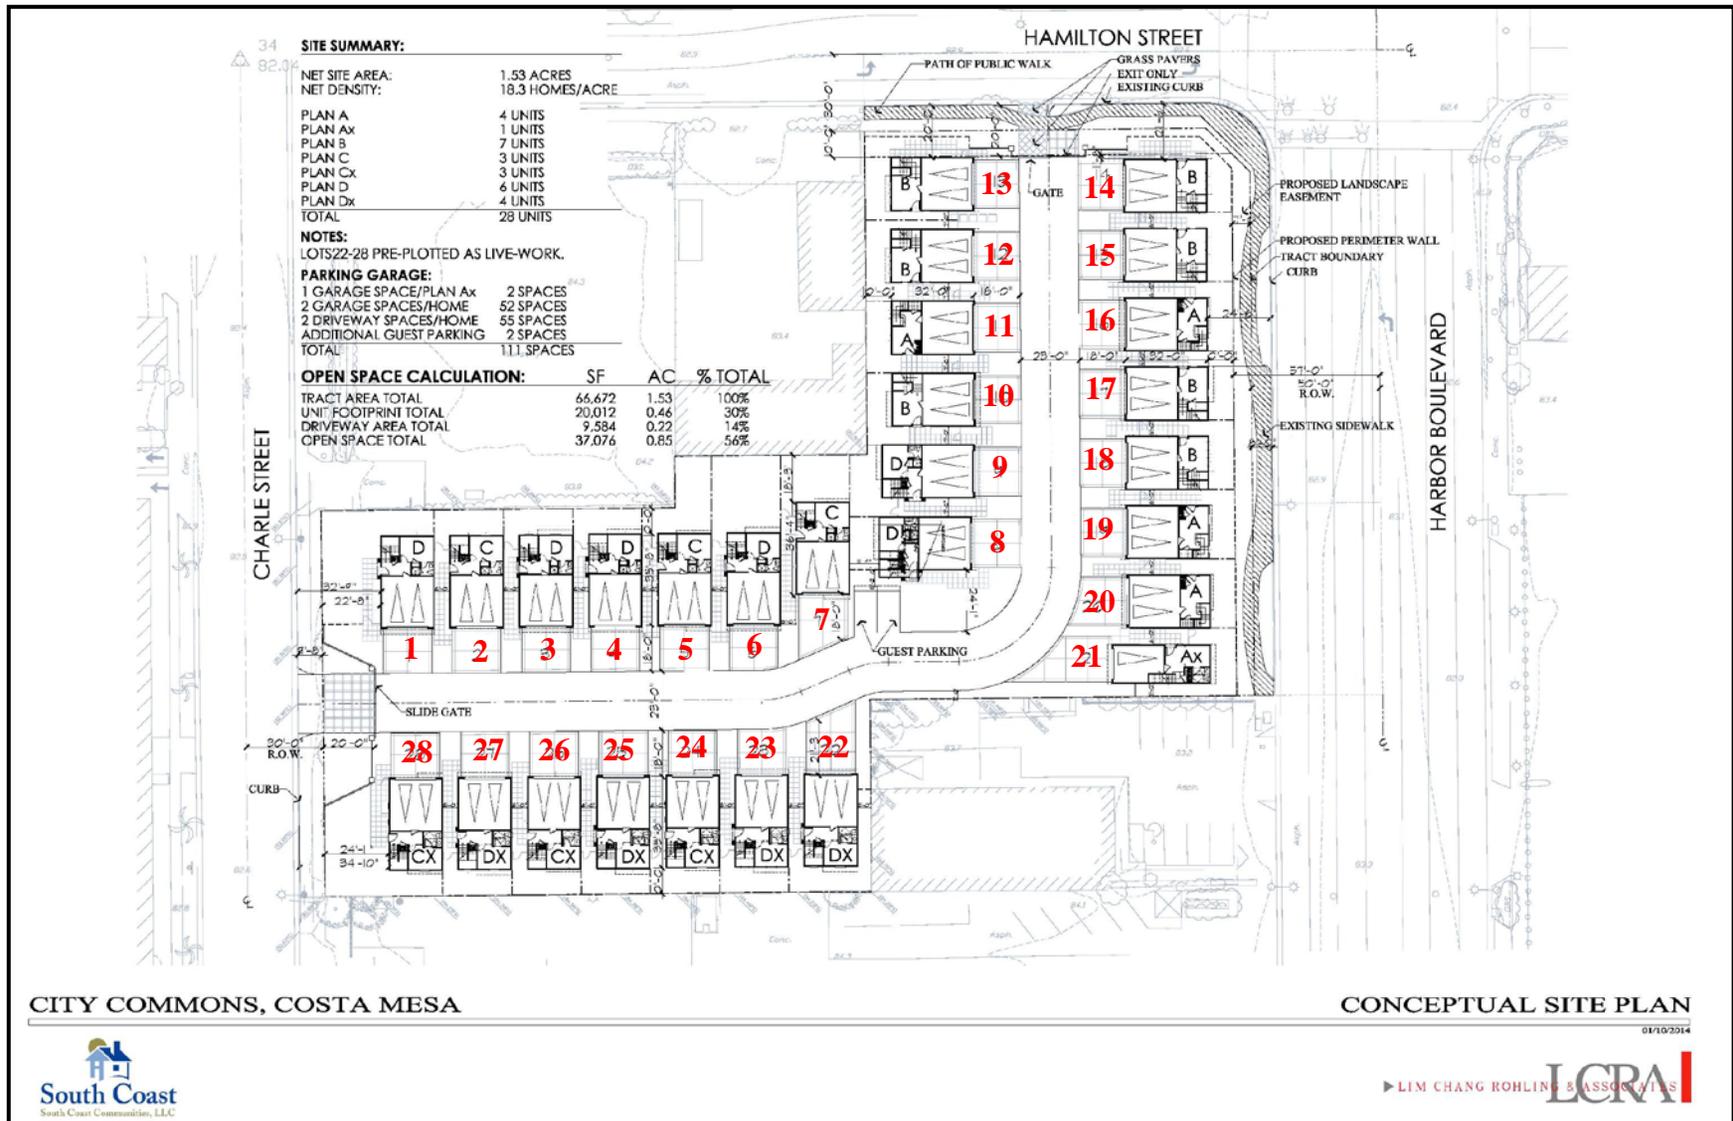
Conceptual Site Plan with Home Lot Numbers
